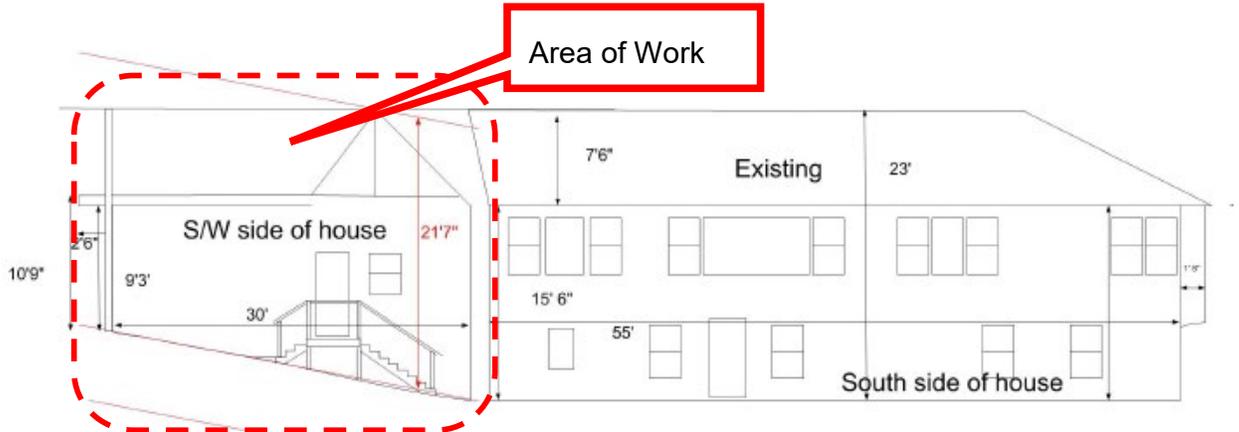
Proposed West Elevation Enlarged (Not to Scale)
